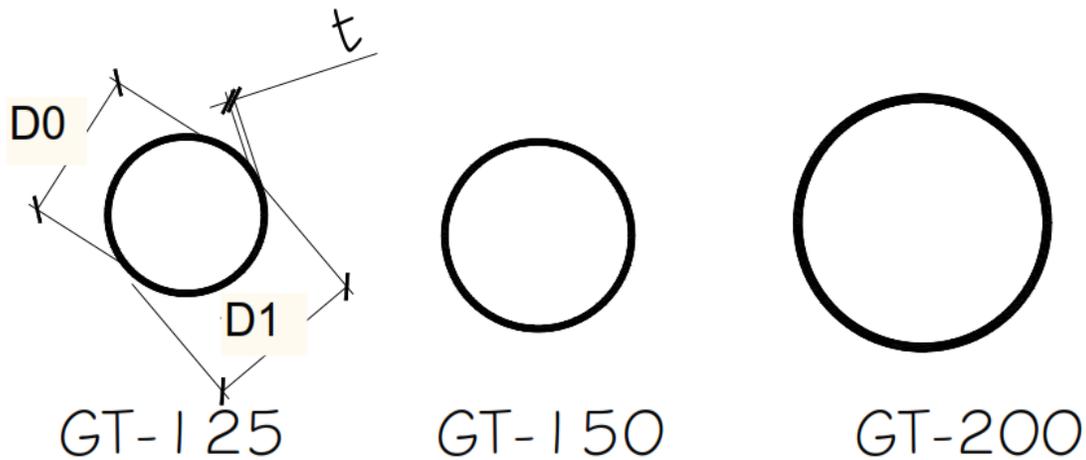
Description, dimensions, and details of Concrete Filled Glass Fiber Reinforced Polymer tube columns (Un- reinforced)
